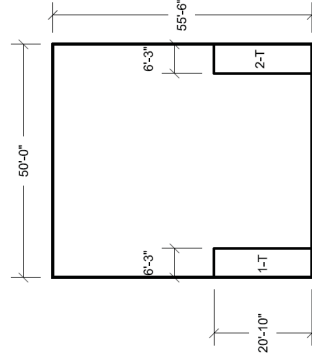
H-6-120A: COOLING TOWER WEST WALL LOOKING EAST
